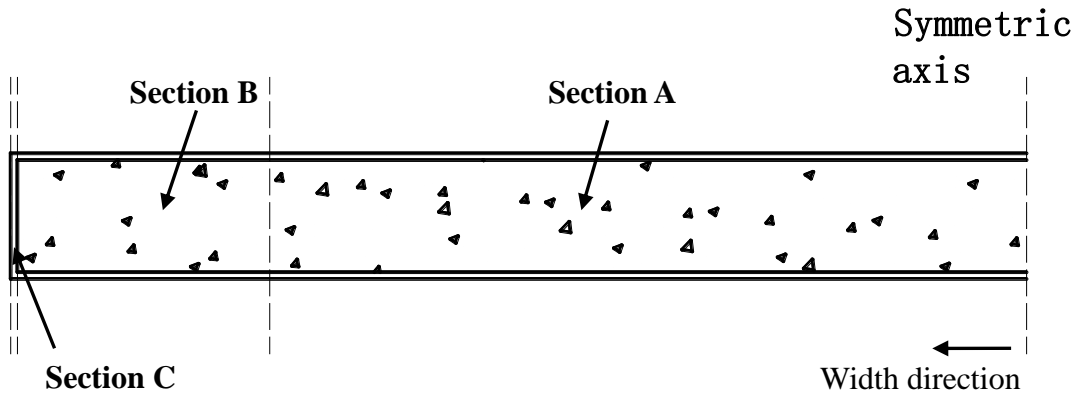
Cross-section of SCS sandwich panel at mid-span
